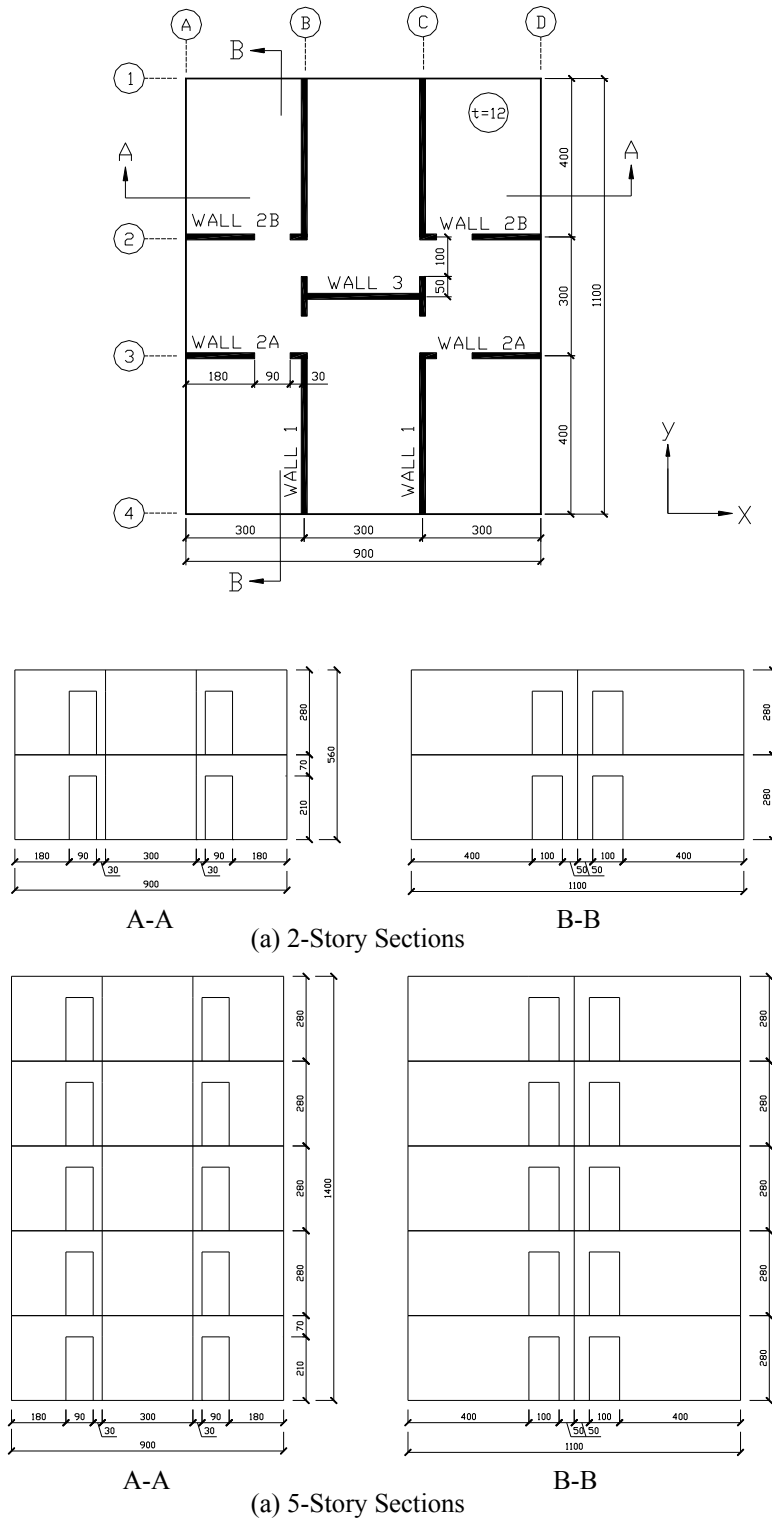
Typical plan view and sections for 2 and 5 story buildings (units are in cm)
